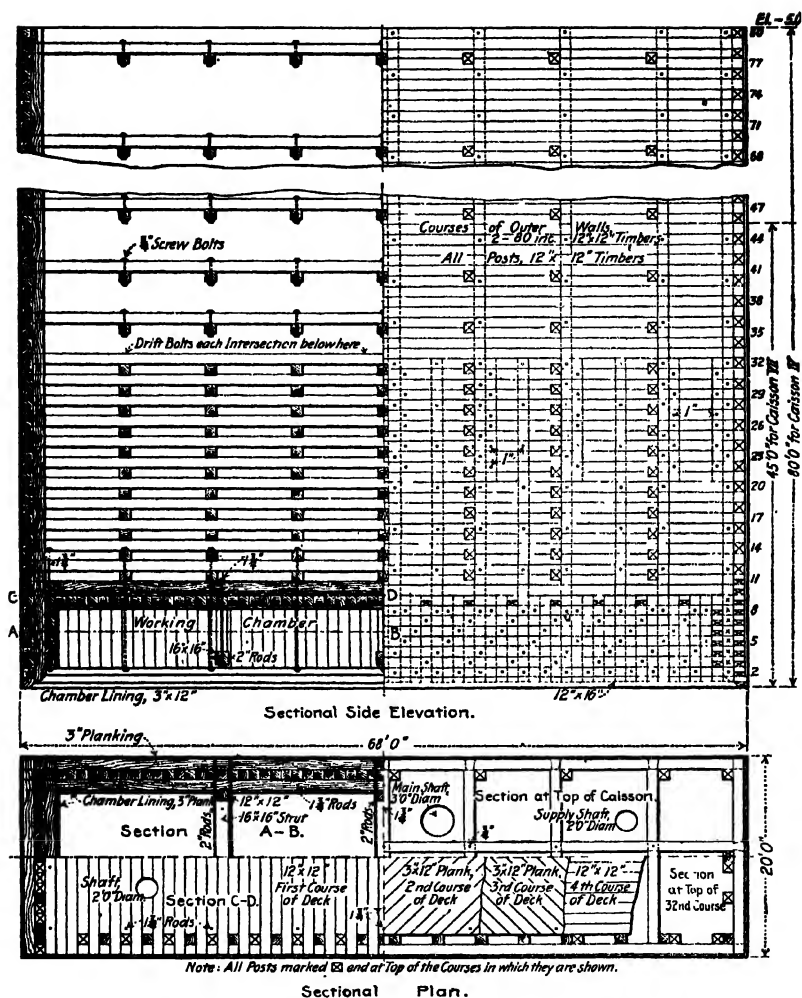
Pneumatic Caisson for Broadway Bridge, Portland, Ore.
